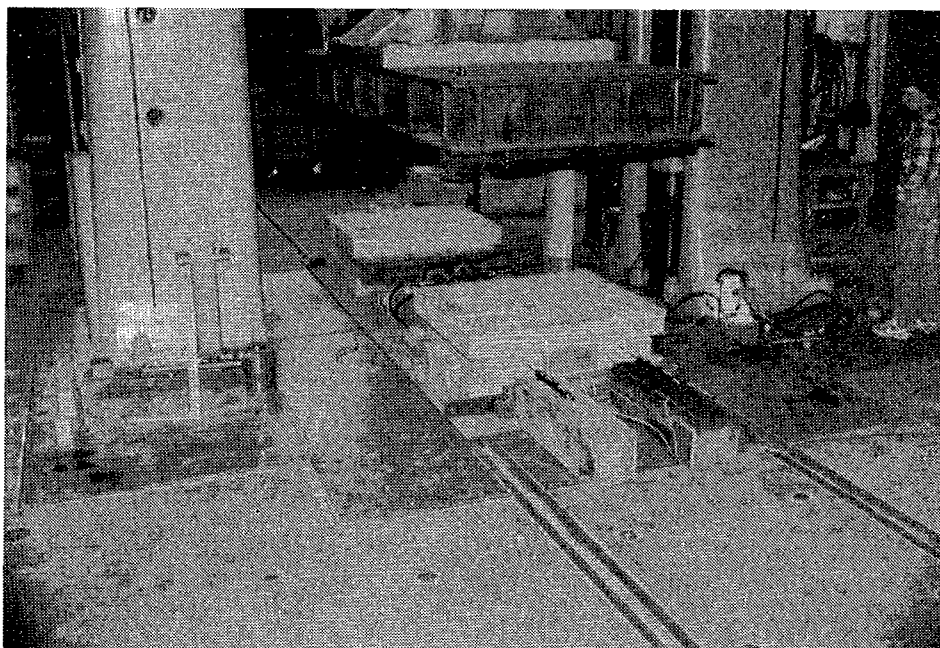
Frictional resistance test — test machine arrangement.
